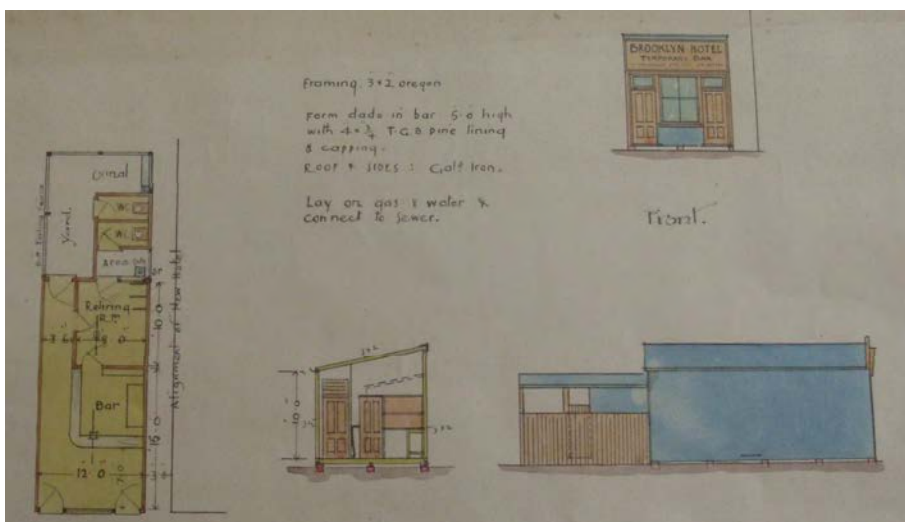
The temporary Brooklyn Bar was built on the adjoining Commercial Building site in 1911 to the design of Assistant Government Architect George McRae. The plan shows the front and side elevations, as well as a floor plan and sectional views.
